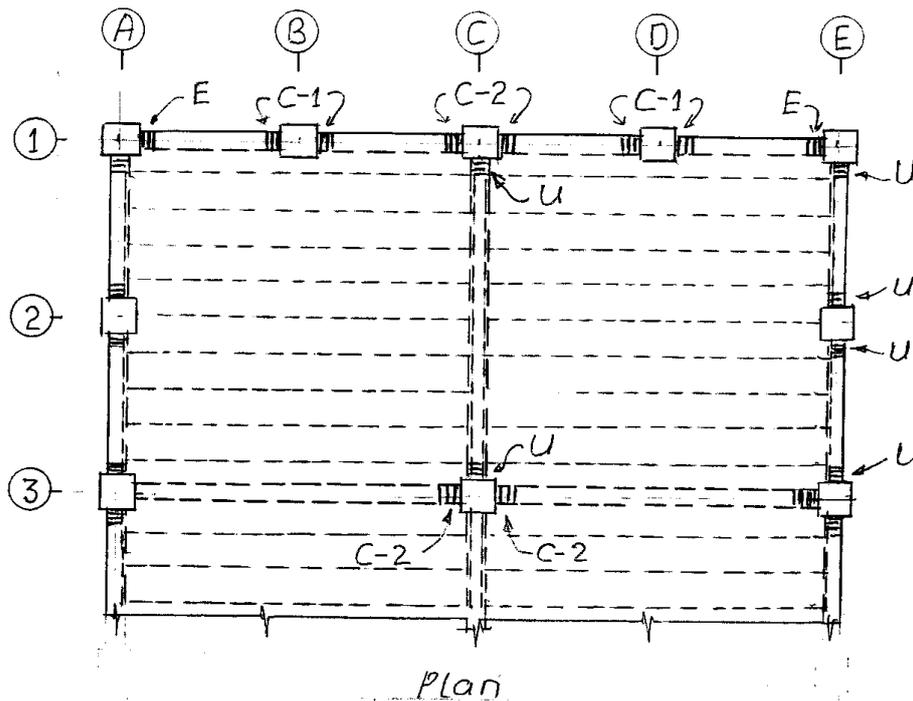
shows potential plastic hinges, labelled as U, E, C1 or C2 on a floor plan. The label varies with the extent that prestressed floor units can restrain elongation in plastic hinges. Tests on Tee beams have shown that normal reinforcement in a slab does not significantly influence elongation [Fenwick et al 1981, 1995]. However, prestressed reinforcement in precast floor units spanning parallel to beams does provide restraint to elongation.
